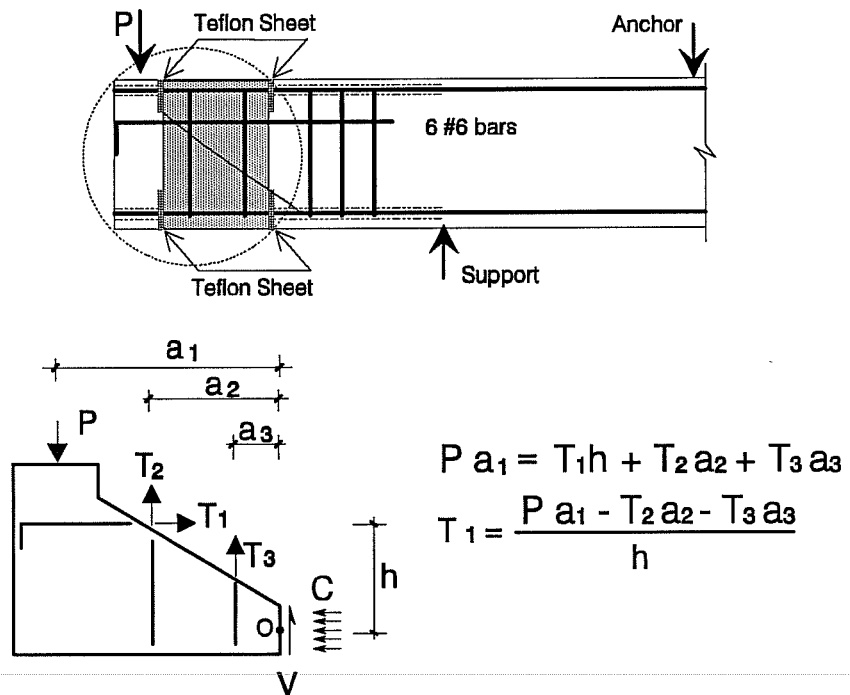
The Separating Diagram of End Concrete Block under the Test with Transverse Reinforcement
